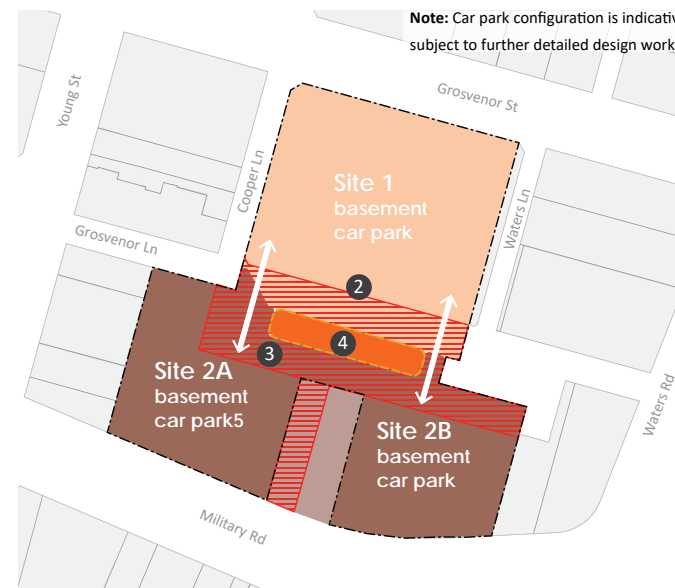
Proposed Grosvenor Plaza car park site - basement levels
